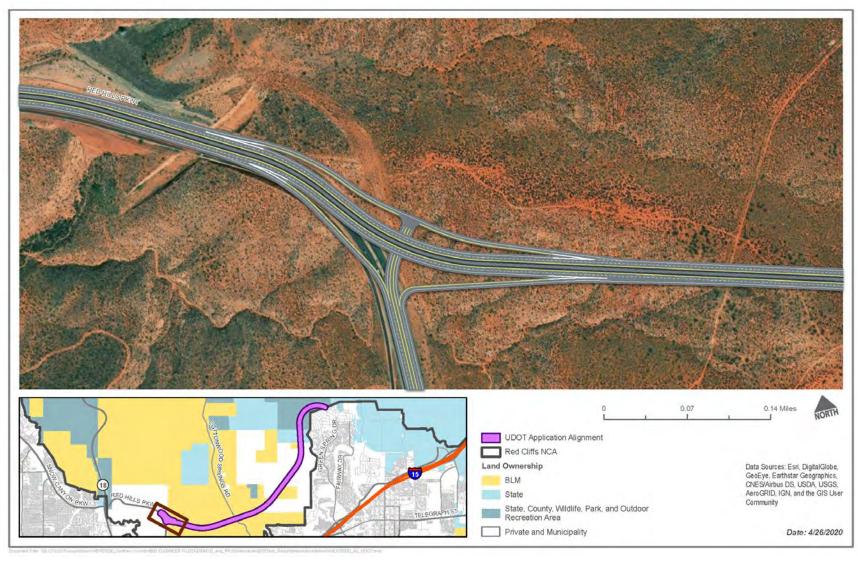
UDOT Application Alignment Plan View (1 of 9)
